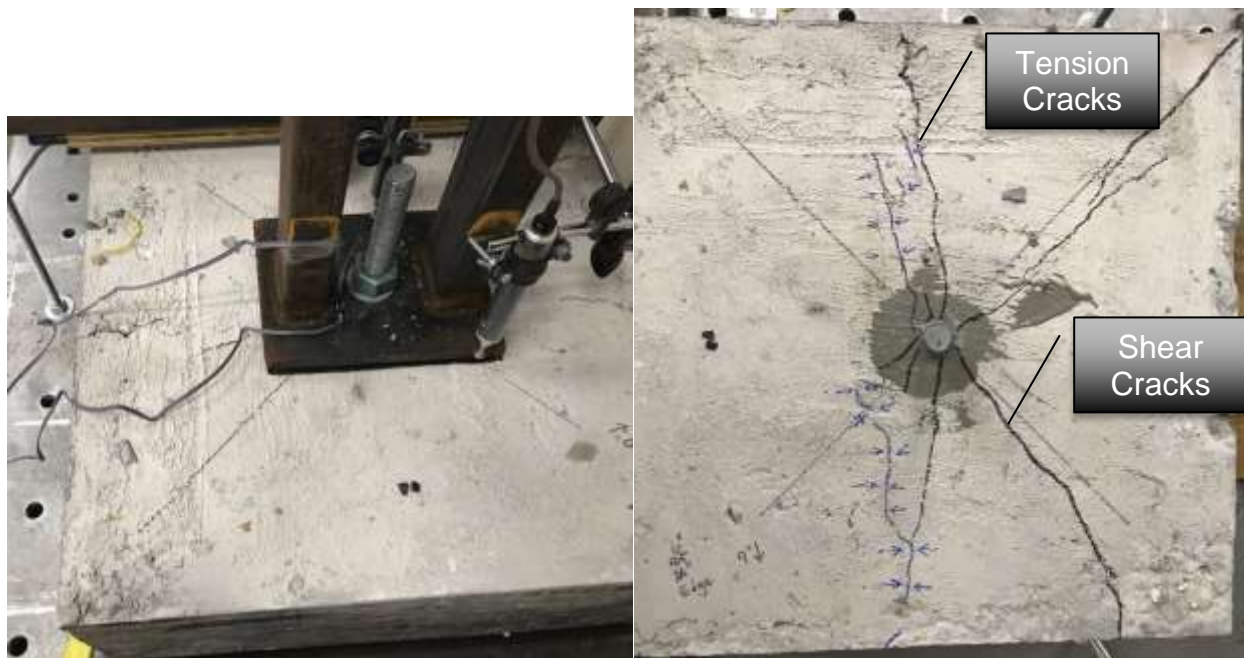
Typical Concrete Breakout/Pry-Out Failures Found in Concrete Block Specimens
